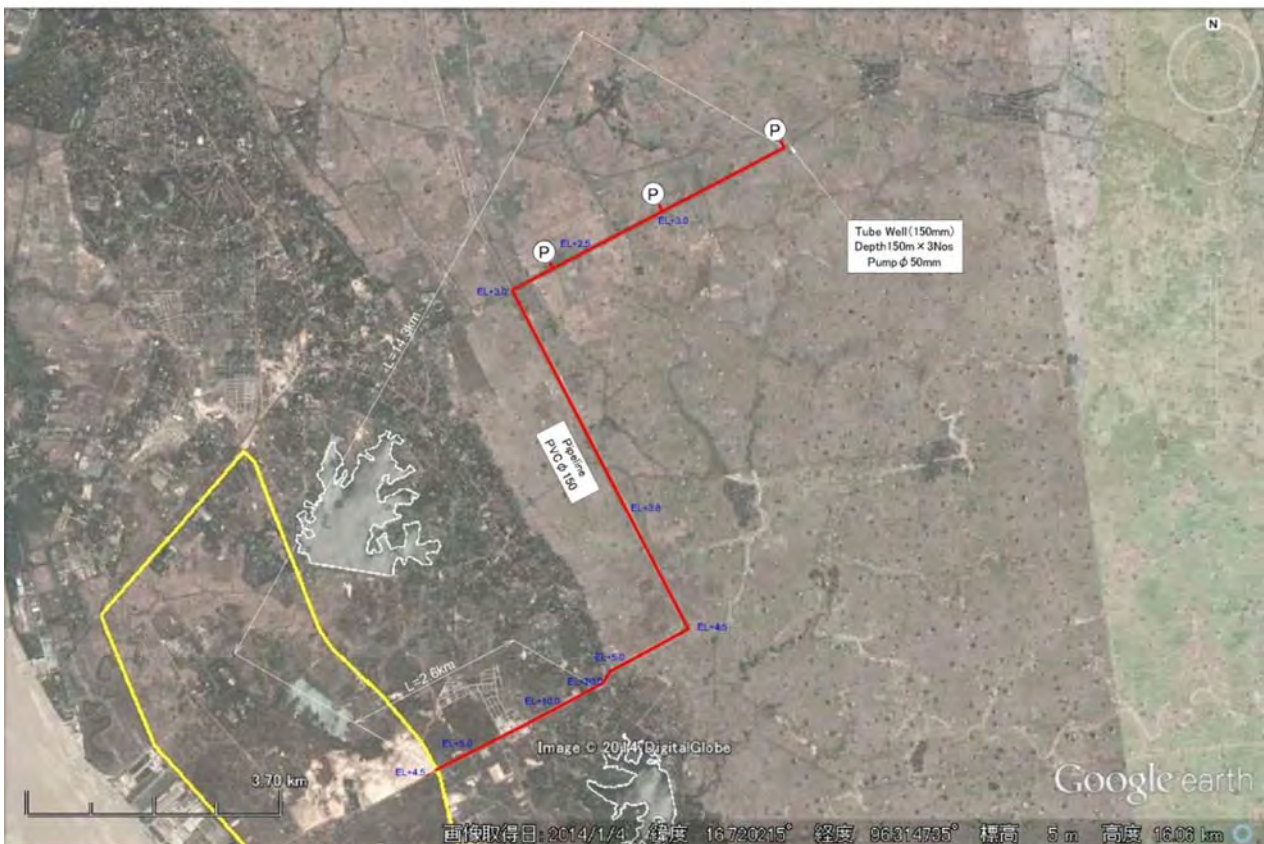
Outline Planning (II New Tube Well on east plain of Thanlyin-Kyauktan Hill)
